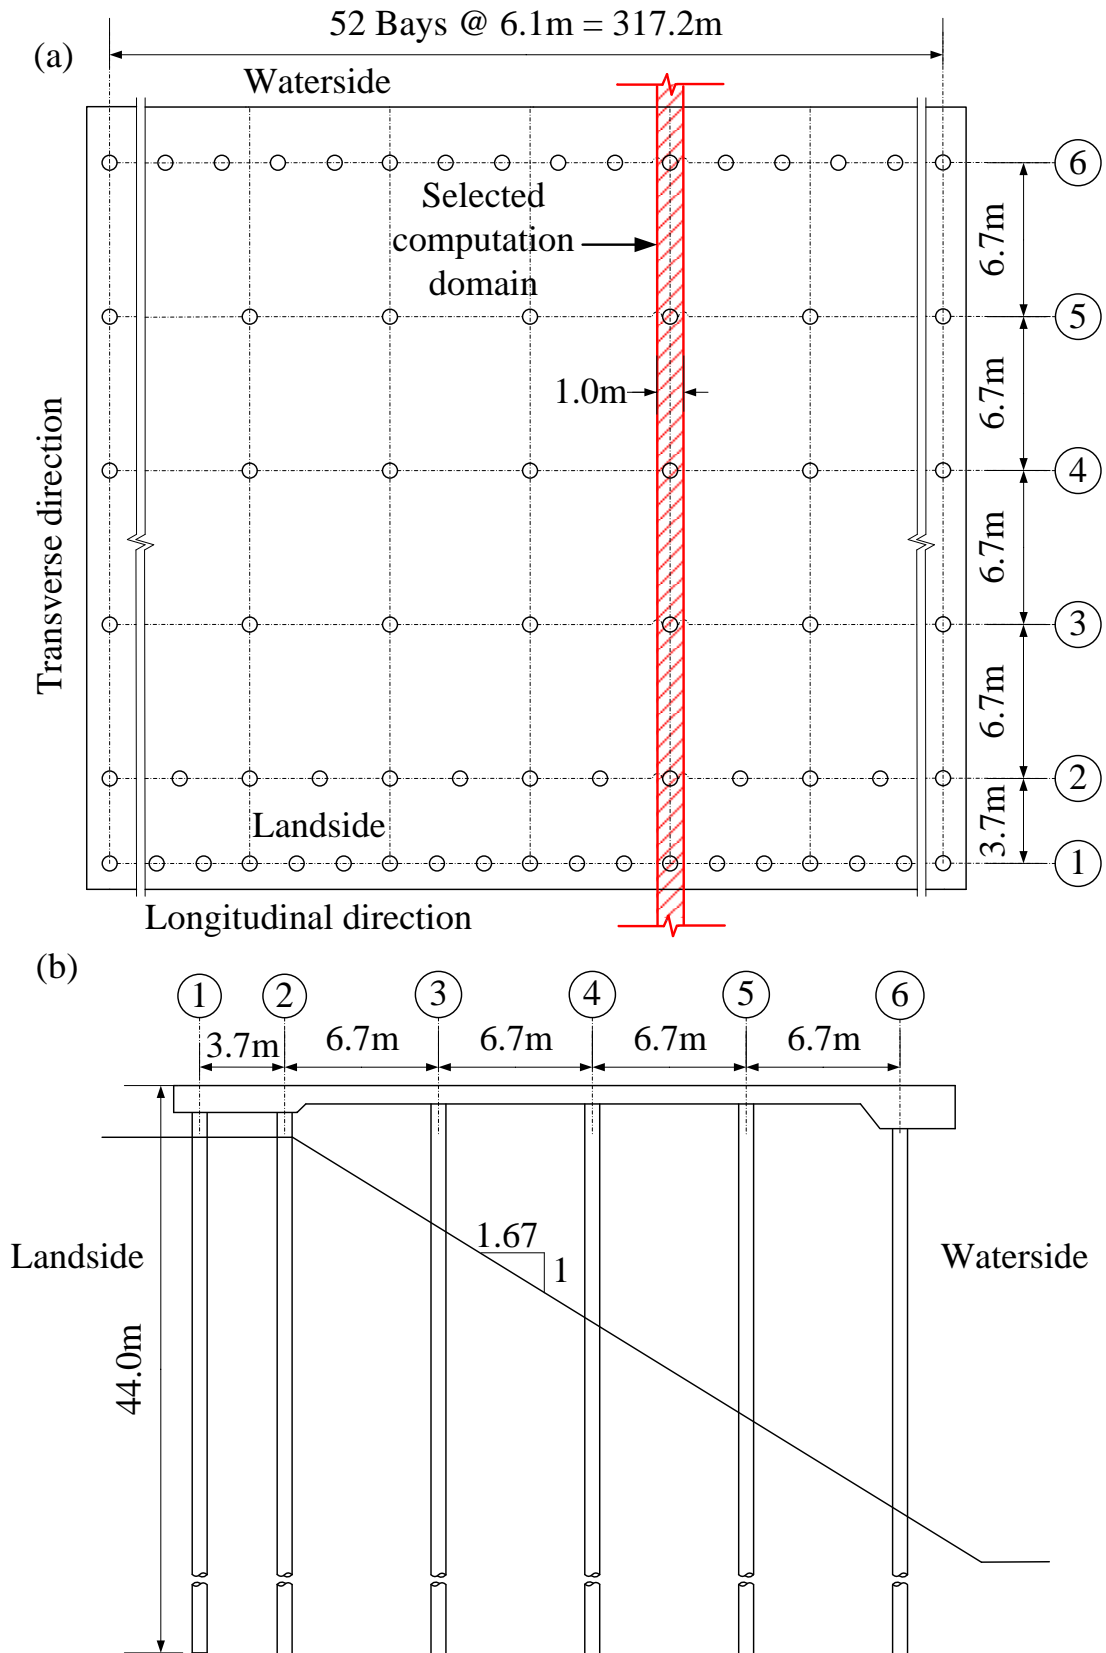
Configuration of wharf structure: (a) plan, and (b) elevation.
